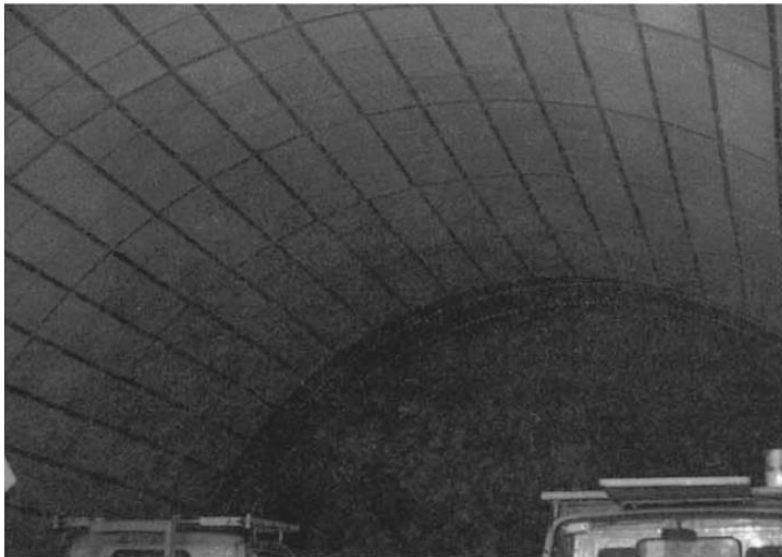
Aluminium foam panels used as noise protection during tunnel construction blasting (2)
